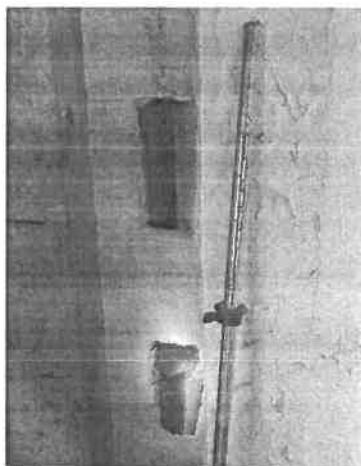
Cavities in concrete brickwork structure (not visible from exterior of building)
